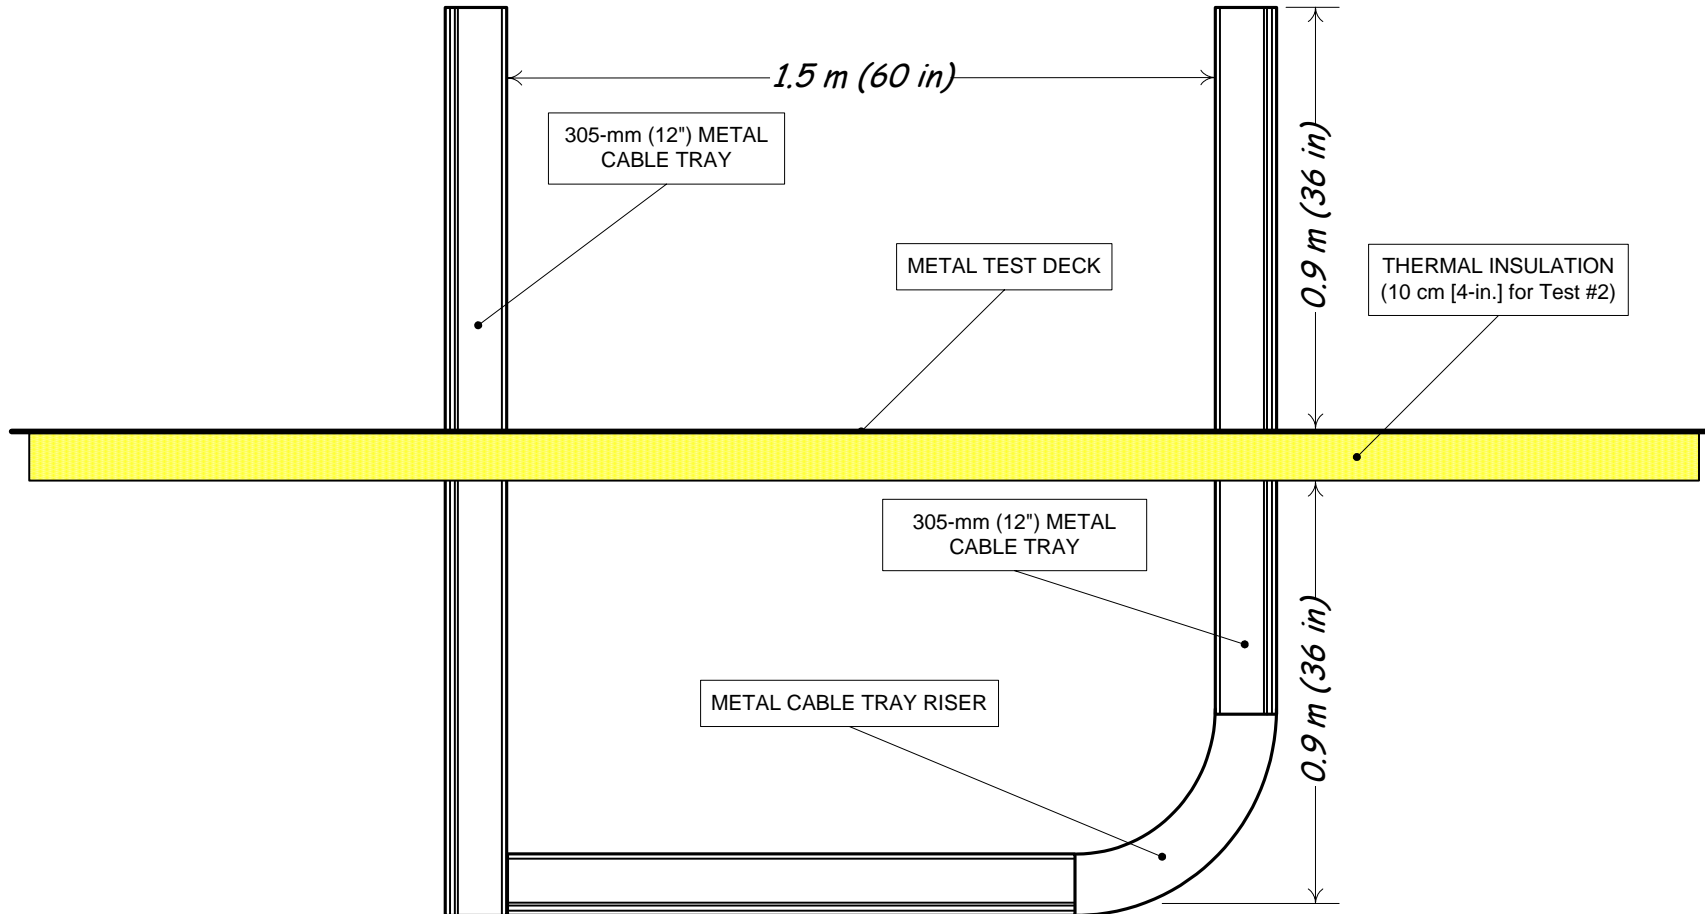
305-mm (12-in) cable tray test specimens (side view with dimensions). Cable trays will be ladder type, 18-gage galvanized steel with 10 cm (4 in) high side rails and 23 cm (9 in) rung spacing.
